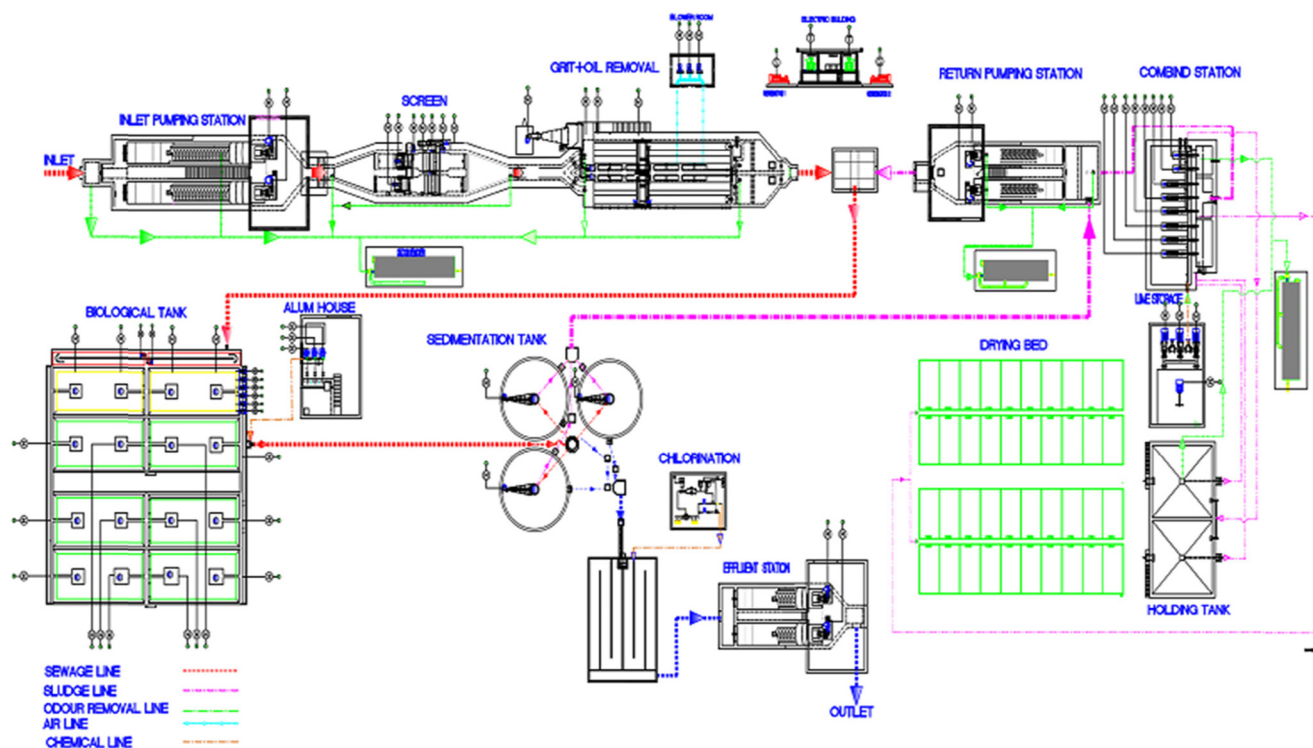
Pipe connection and layout of wastewater treatment plant.
